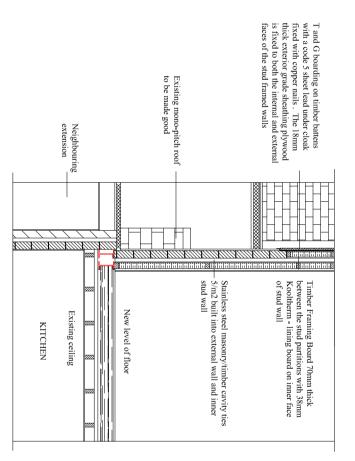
#### DETAIL "D" INDICATION EXTERNAL WALL ABOVE GROUND FLOOR LEVEL
